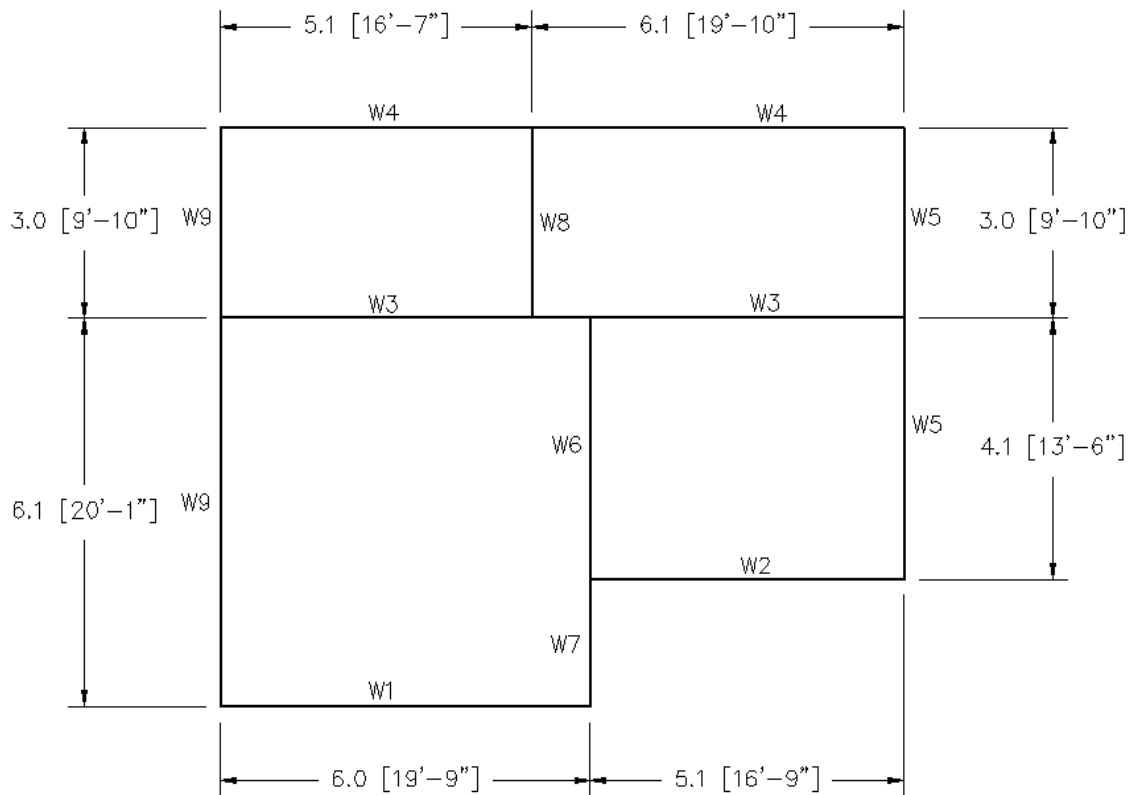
Wall Locations Used in SAP2000 Model – m (ft-in)
